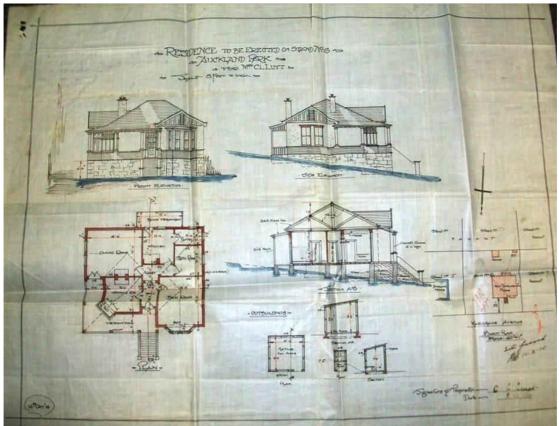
Original plan for proposed new residence on Stand 887 from 1915 (Source: City Council of Johannesburg, Plans Archive)
